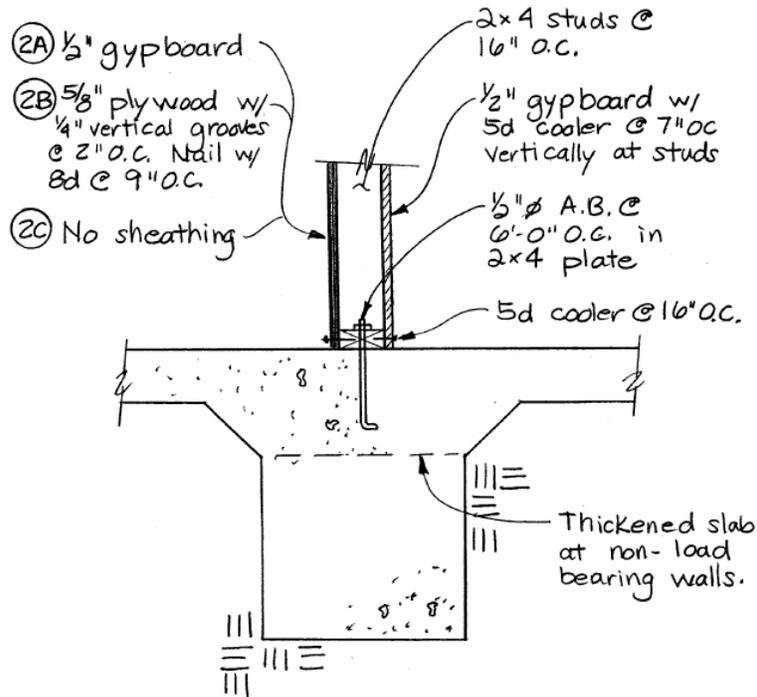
Index building 3 interior wall footing (detail 2-S2)
